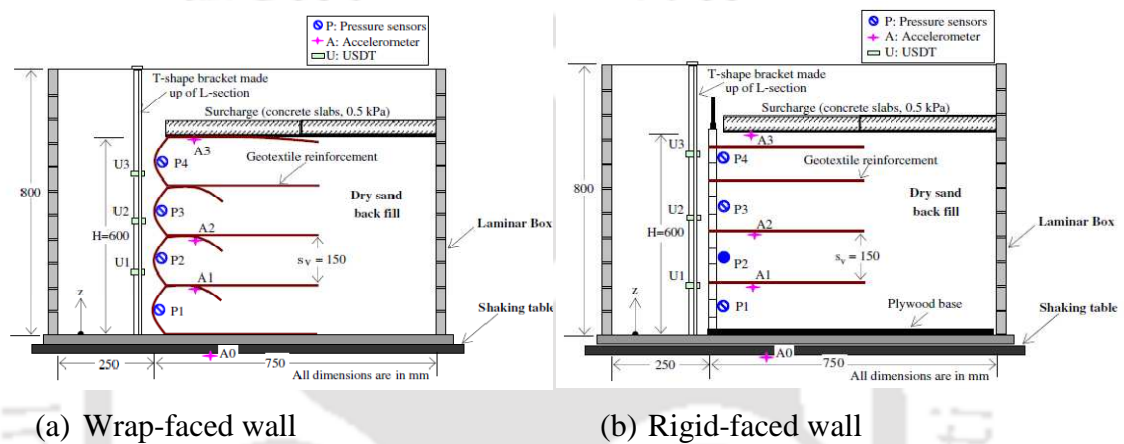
Schematic diagrams of typical test wall configurations and instrumentation adopted by Latha and Krishna (2008)
